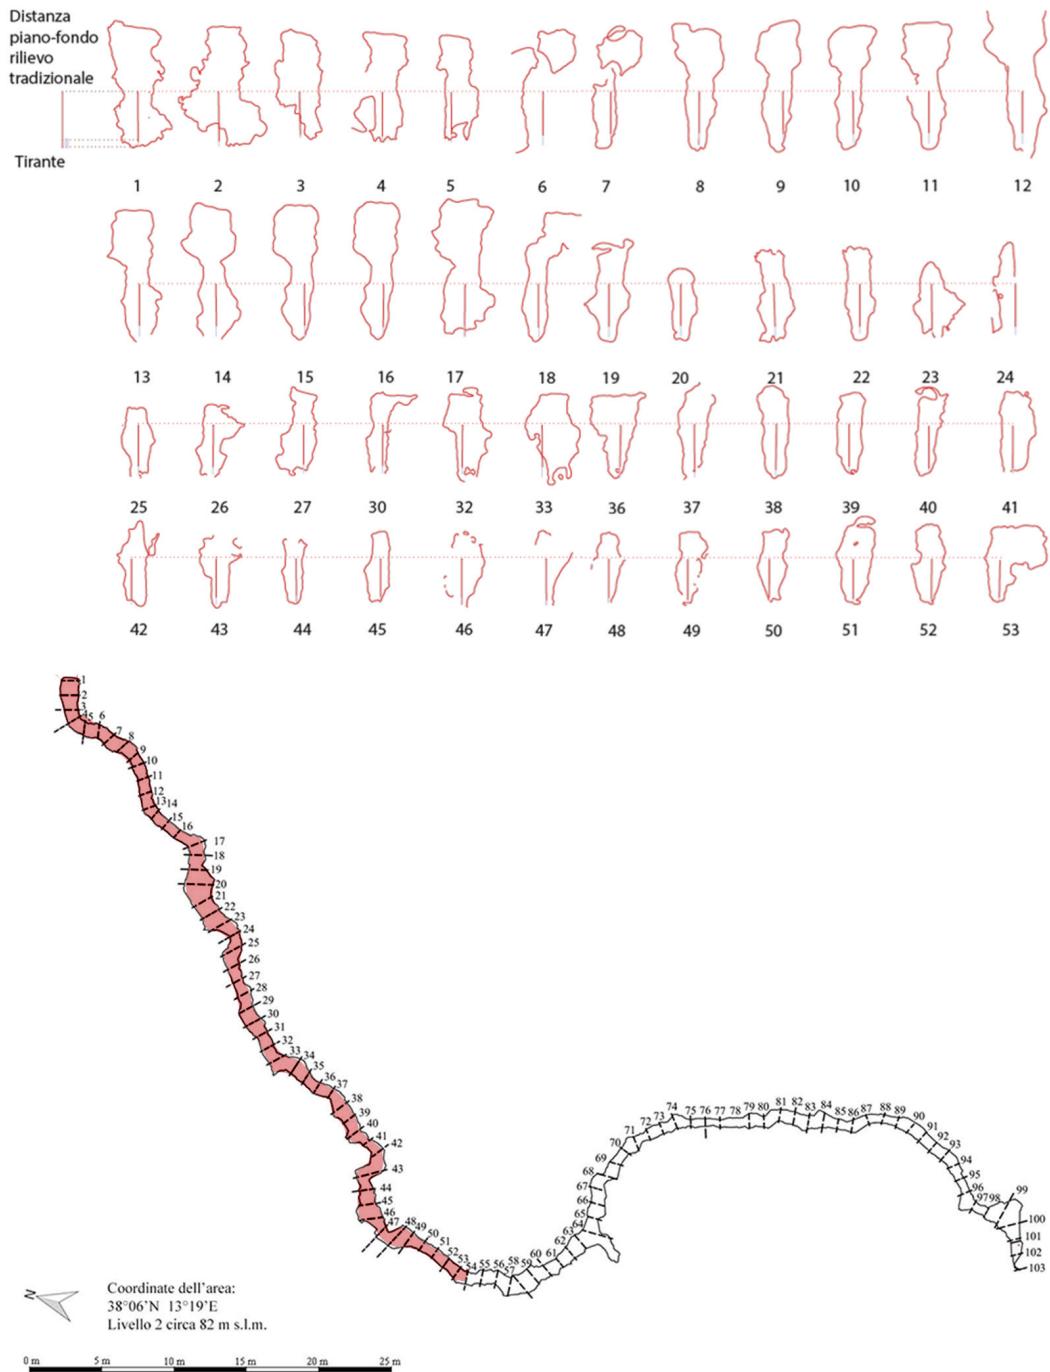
Graphic restitution of *qanāt* sections in plan and elevation.
